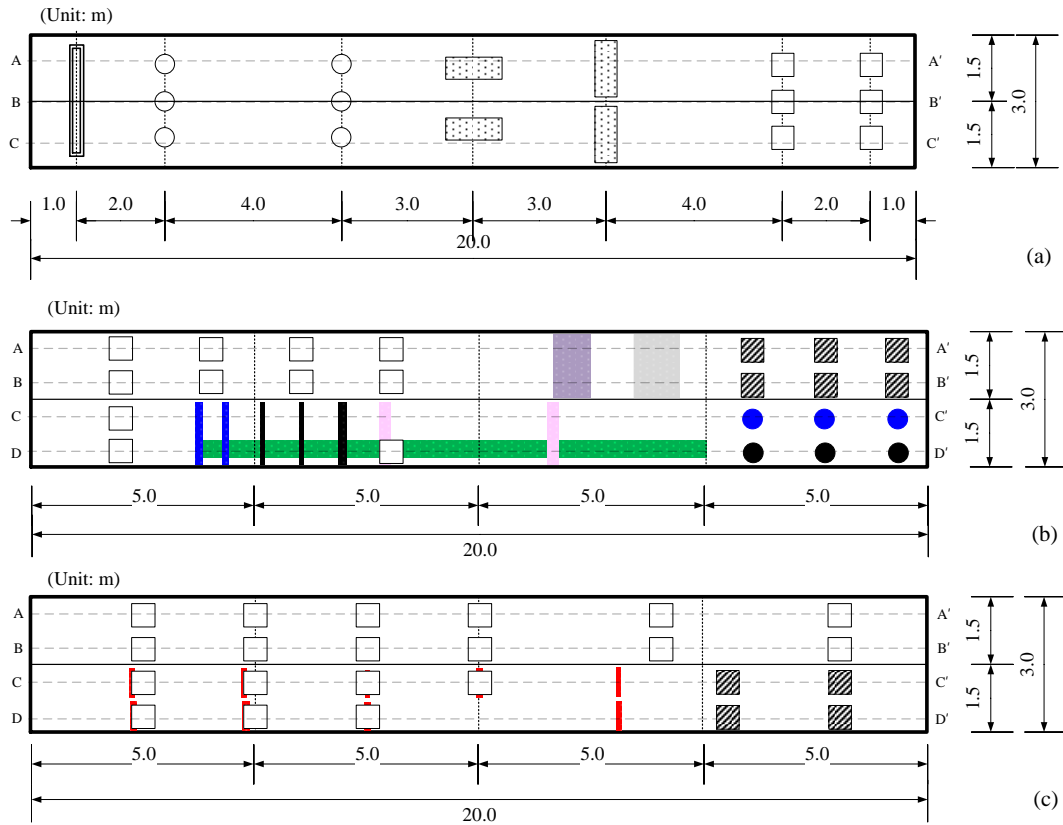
Plan view of underground buried structures: (a) Section 1, (b) Section 2, and (c) Section 3
